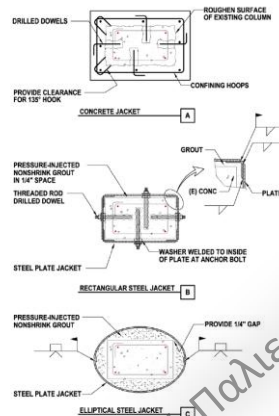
Concrete and Steel Overlay for Concrete Columns
